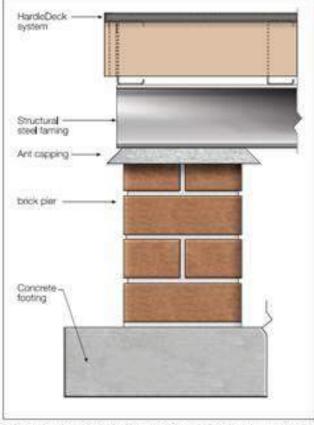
MASONRY PIER AND STEEL SUB FRAMING - OPTION 2
